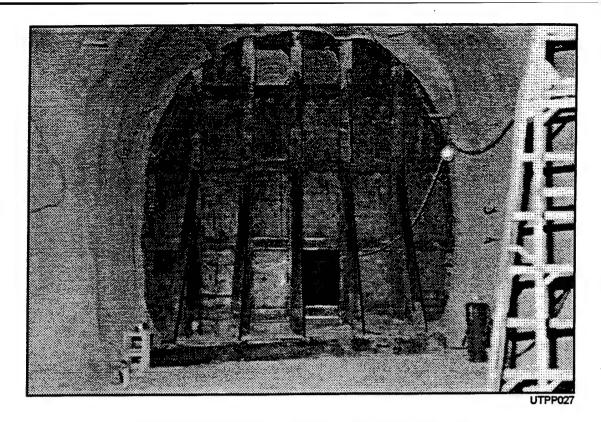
Back of Lower Bulkhead Prior to completion. Shown are Supports and Access Opening
